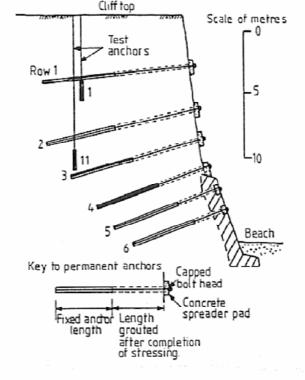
Anchor arrangement for cliff stabilization in chalk, Isle of Thanet (from Hanna, 1982)
